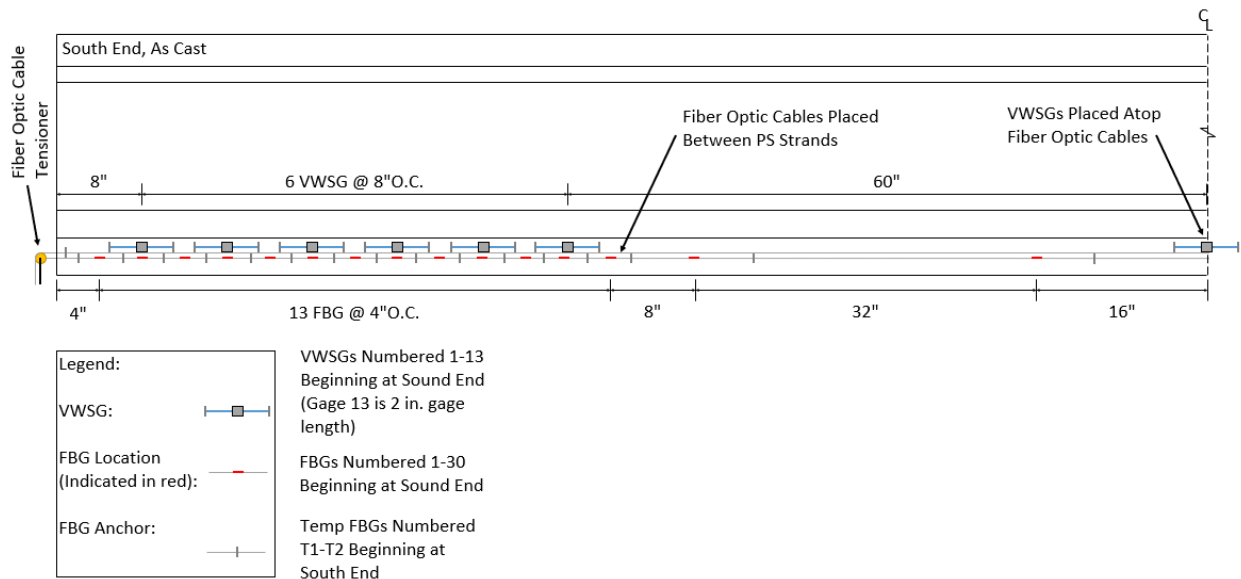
Internal instrumentation plan for SPTC prestressed beam
